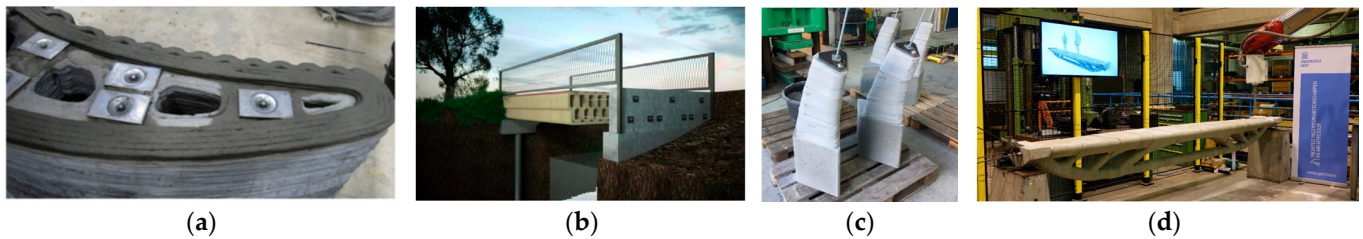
Printed concrete members reinforced using post-tensioning: (a) concrete bench (Lim et al., 2011), (b) conceptual design of concrete bridge deck by BAM [69], (c) concrete column [70], and (d) concrete girder [71].
